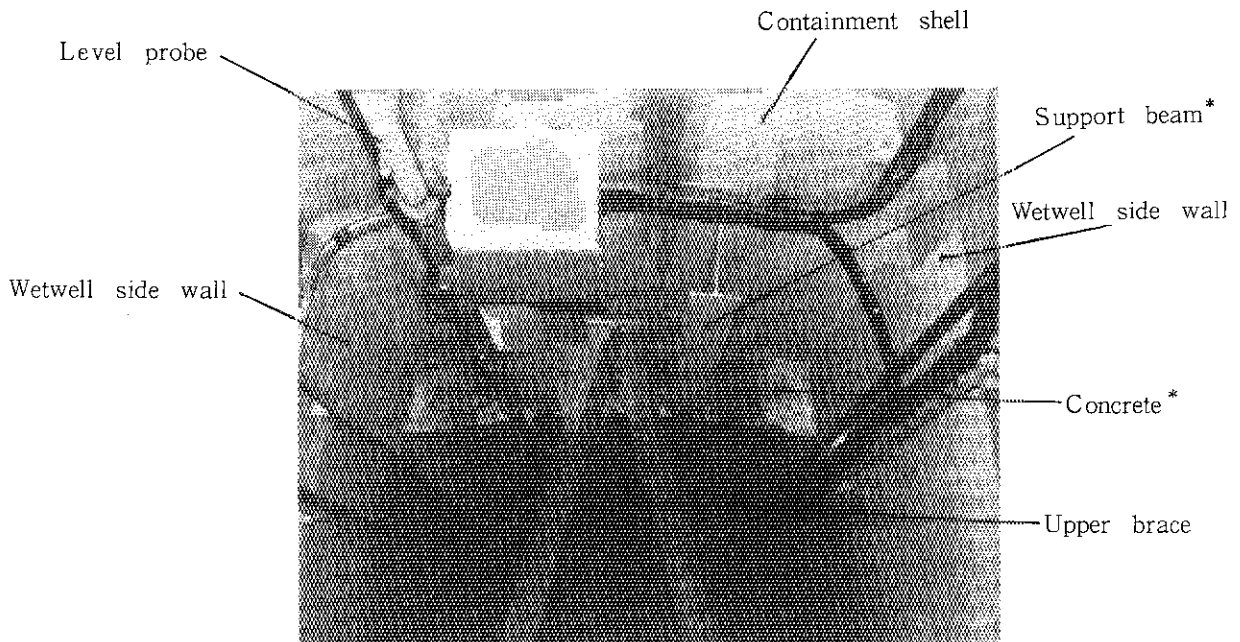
Containment small-shell as of after stiffening (viewed from top of wetwell)
